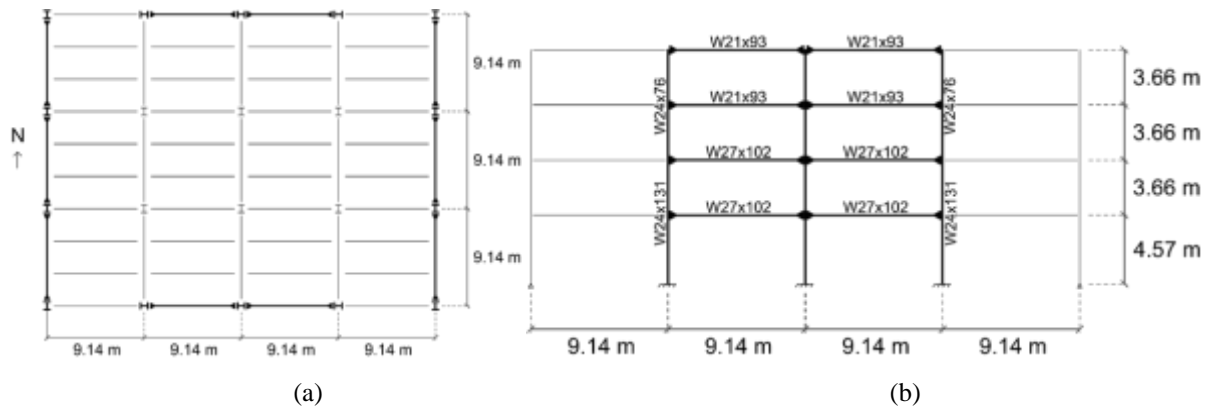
Case-study steel framed-building considered in this study: a) Plan view, b) East-West elevation.
